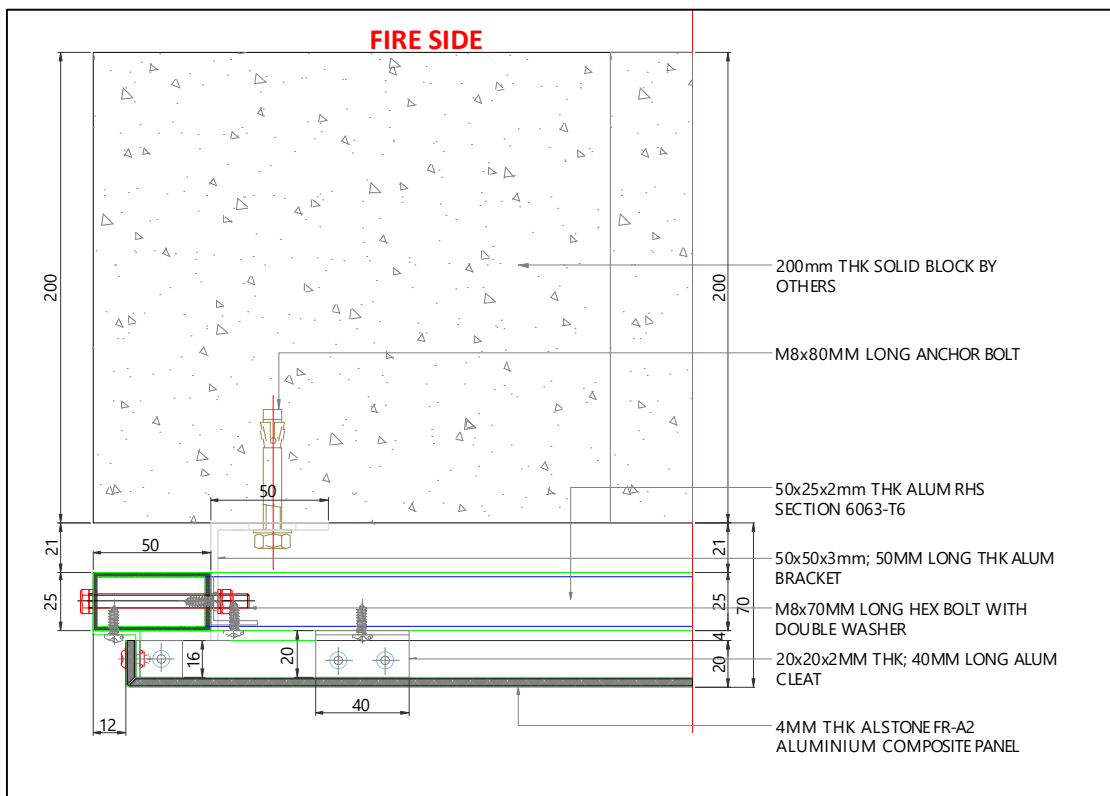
Vertical section detail of the specimen at the ACP horizontal joint.
